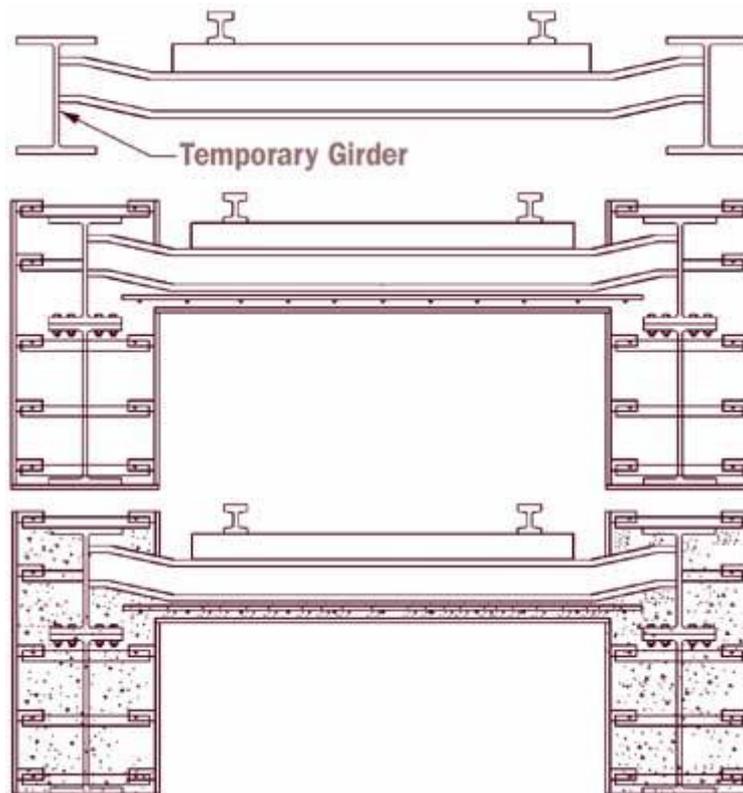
Use of temporary girders as part of the permanent structure, FHWA (2005)
